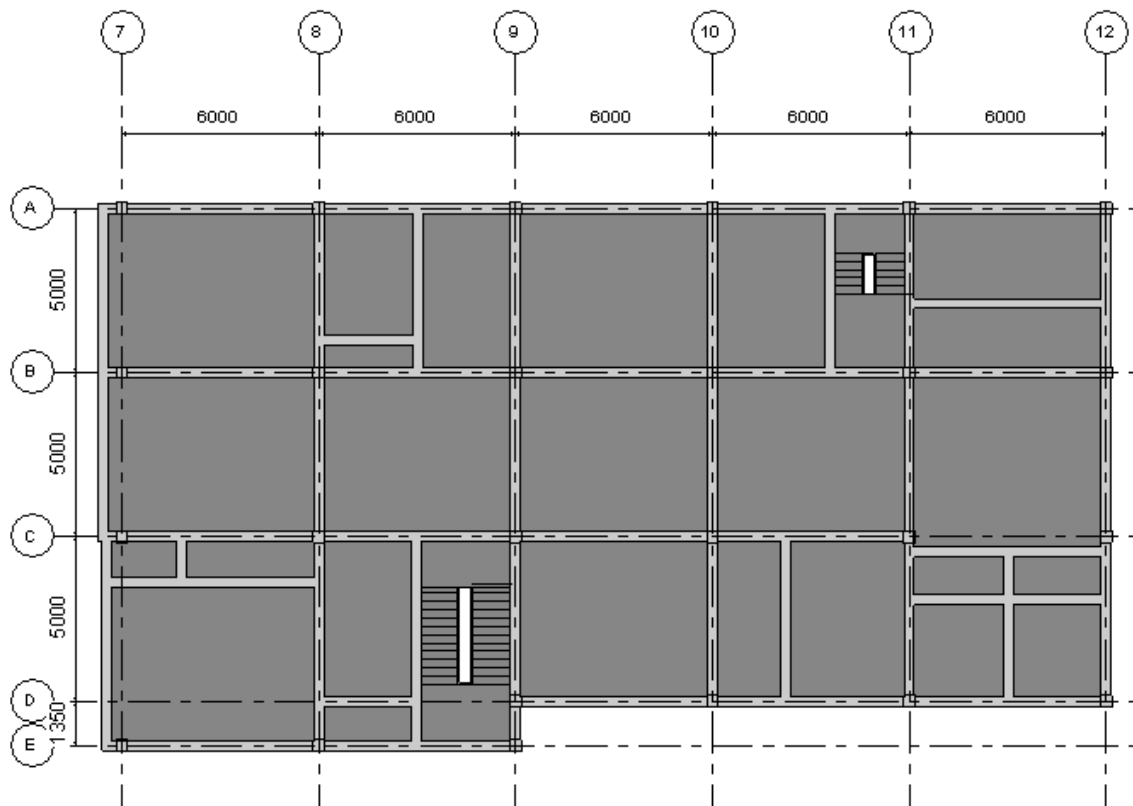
Typical First Floor Beam and Slab layout
